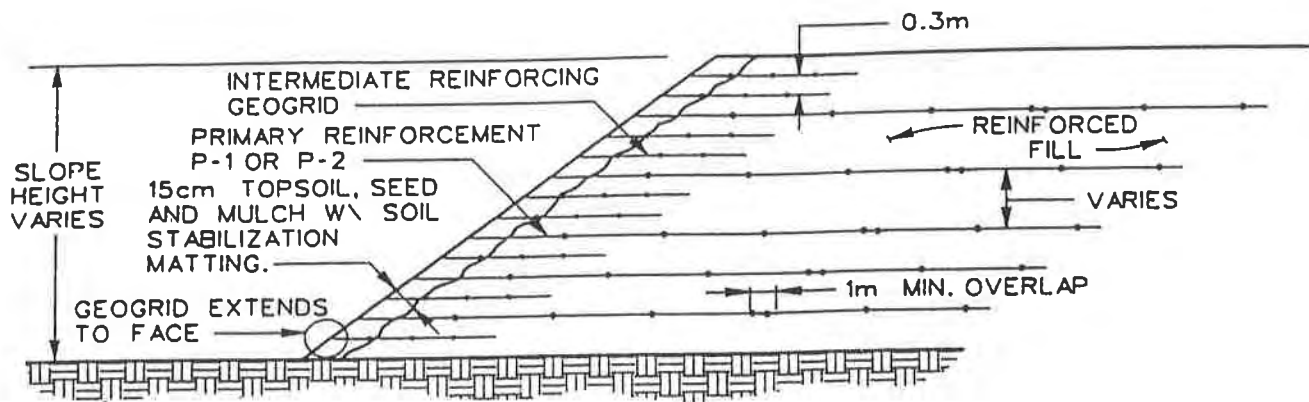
TYPICAL REINFORCED SLOPE SECTION
